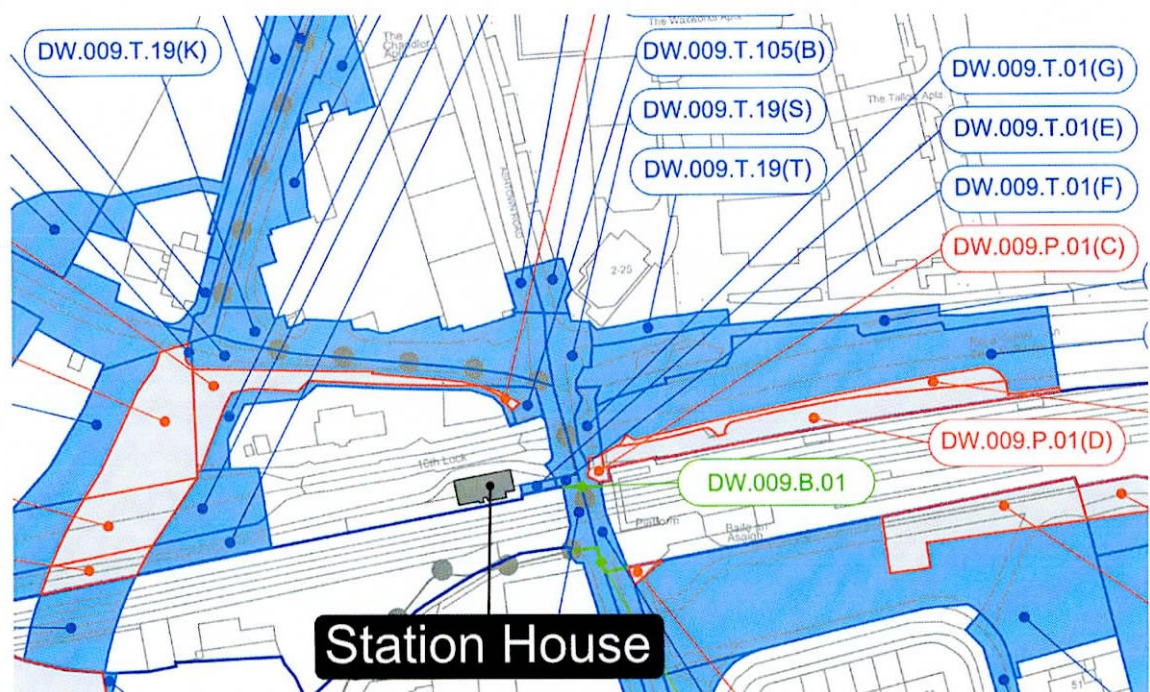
Property Plan DW009 Excerpt (Annotation added)
